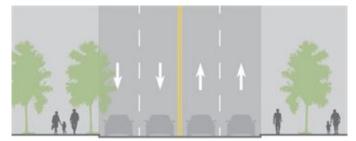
| Alternative 2 cross-section of Spring Hill Road from Tyco Road to Route 7
